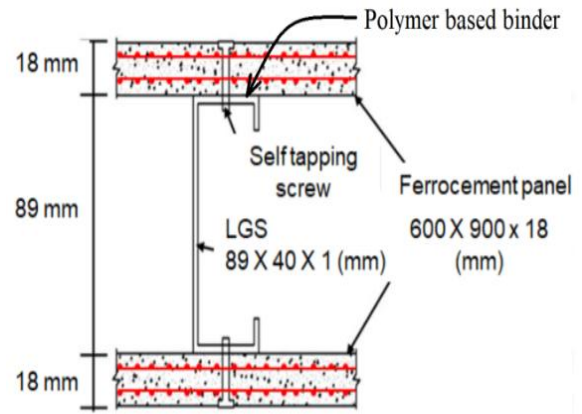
Connections Between Ferrocement Panel & LGS Section
